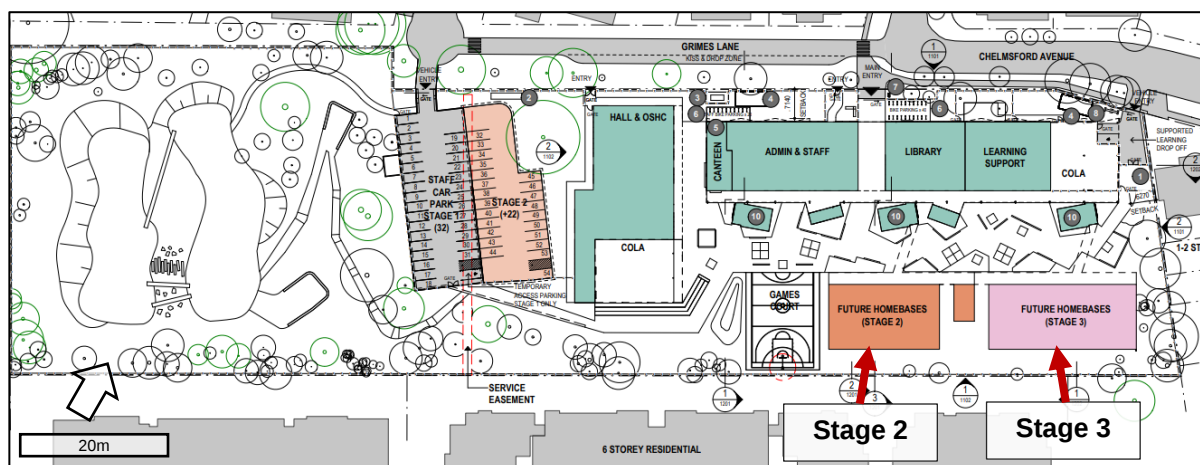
| Stage 2 and Stage 3 originally proposed building envelopes (Source: Applicant's EIS 2021)
